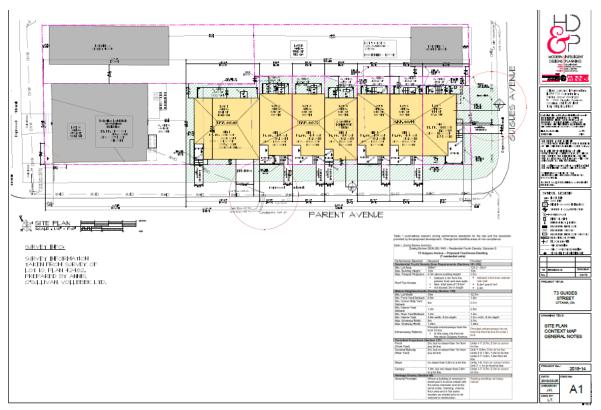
Survey Plan A1 showing the layout for the proposed development. Source: Hamel Design and Planning Rev. 19, August, 2009..
